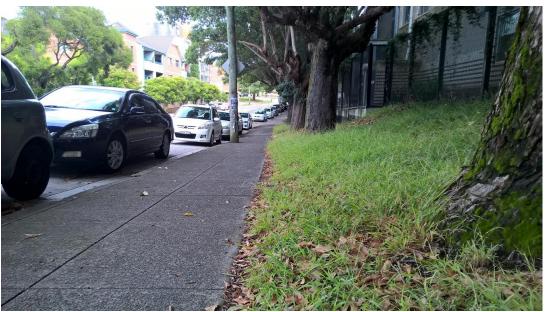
Trafalgar Street (west of Audley Street). Proposed widening of footpath (and associated kerb widening) to provide a 2.5m shared path by minor reduction in width of adjacent parking and traffic lanes.
